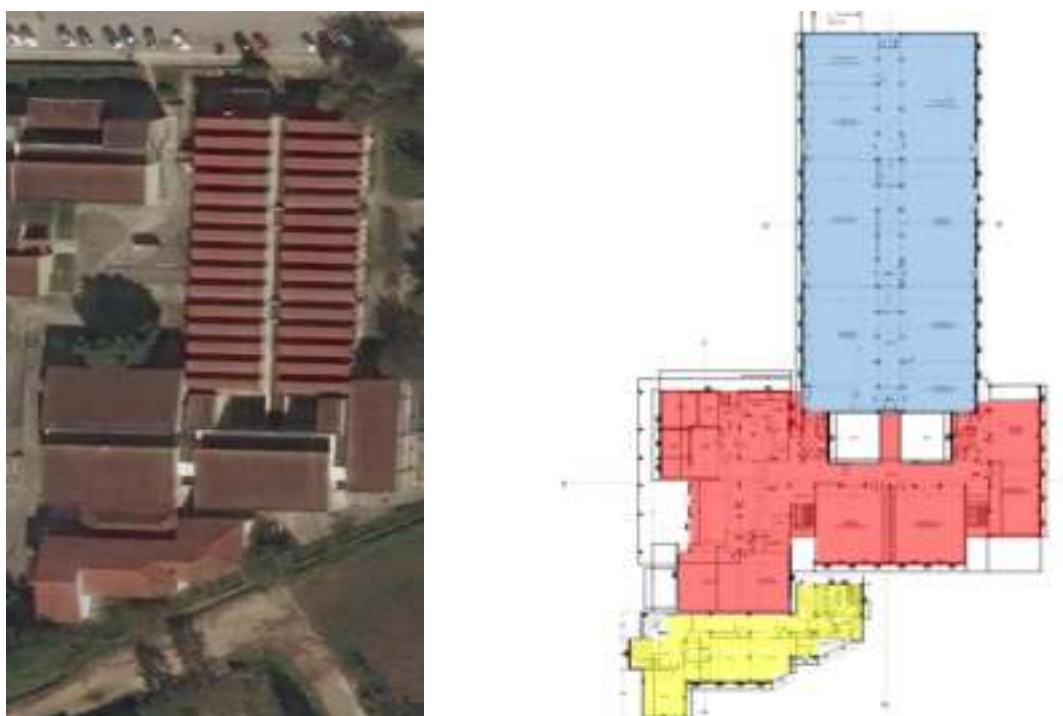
Aerial view (left) and layout of the School of Technical Education building (right)
